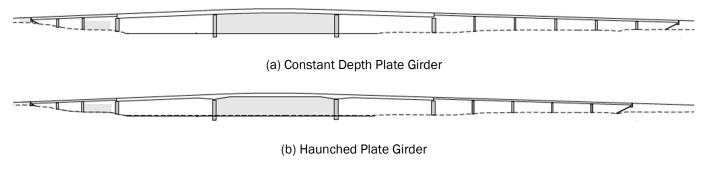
STEEL PLATE GIRDER BRIDGES, OPTION 1(A) AND 1(B).
